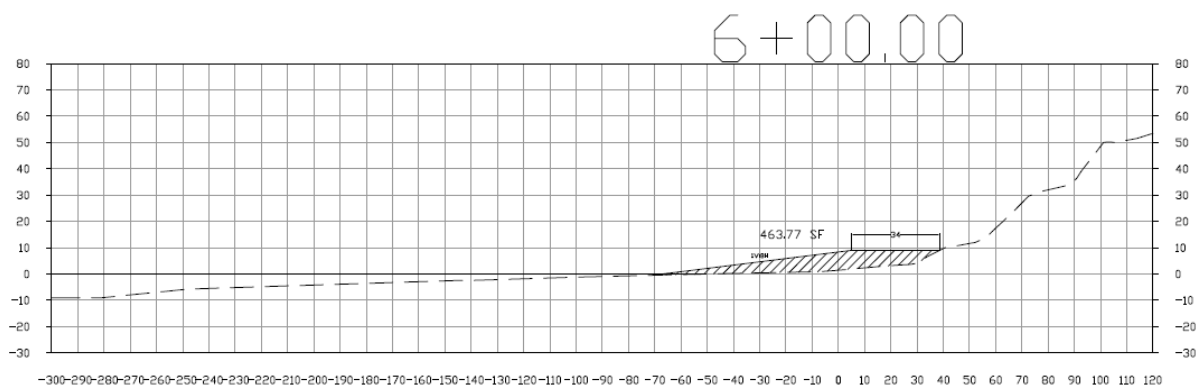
(c). Typical beach fill cross-section at Sta 6+00
